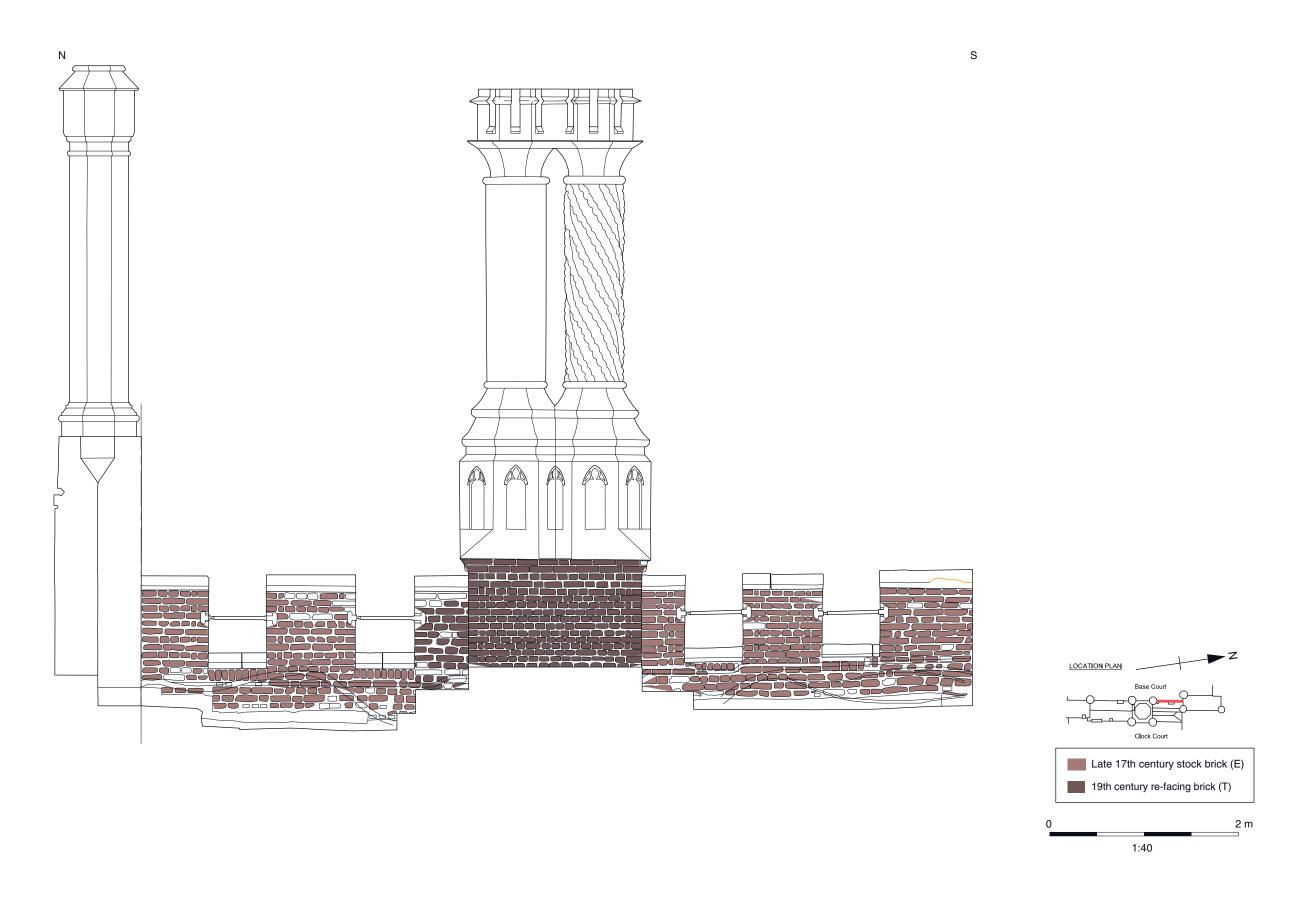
Hampton Court Palace, Base Court V, West Facing Elevation – Part 3, Parapet Internal Elevation
